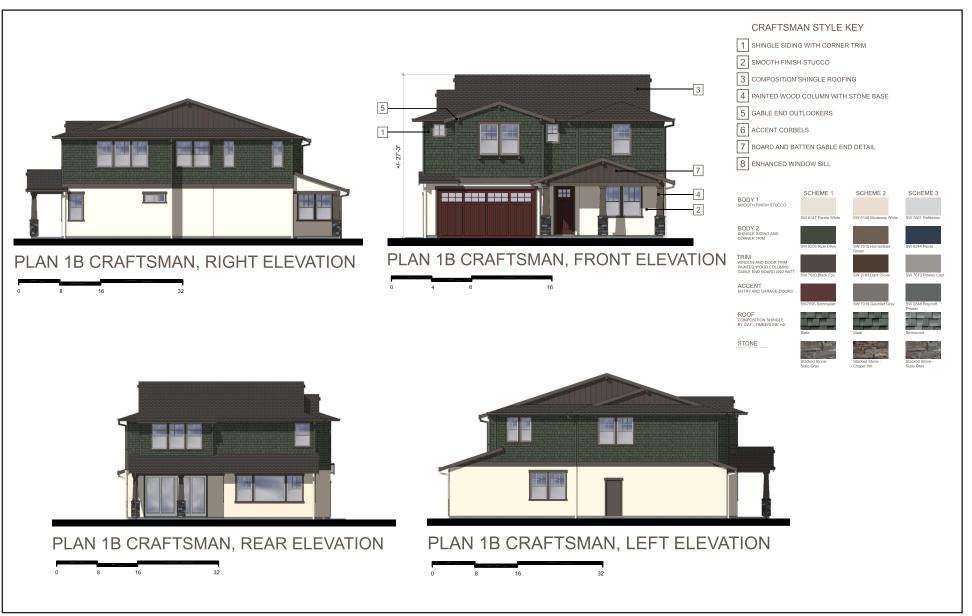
Residential Project - Craftsman Style Conceptual Elevation
